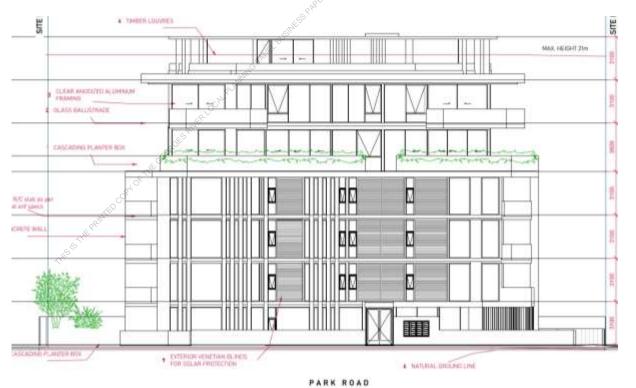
Southwest elevation facing Park Road (Source: Architectural Plans)
